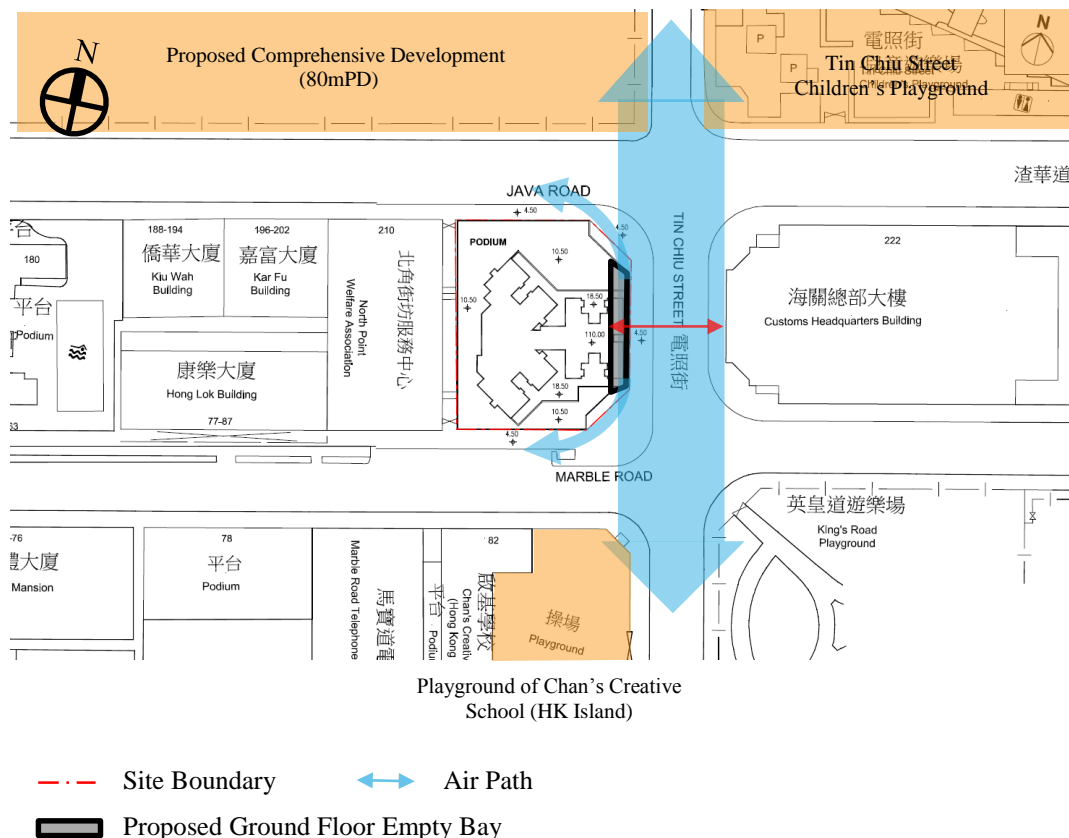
Recommended Location of Ground Floor Empty Bay (site layout subject to detailed design)
